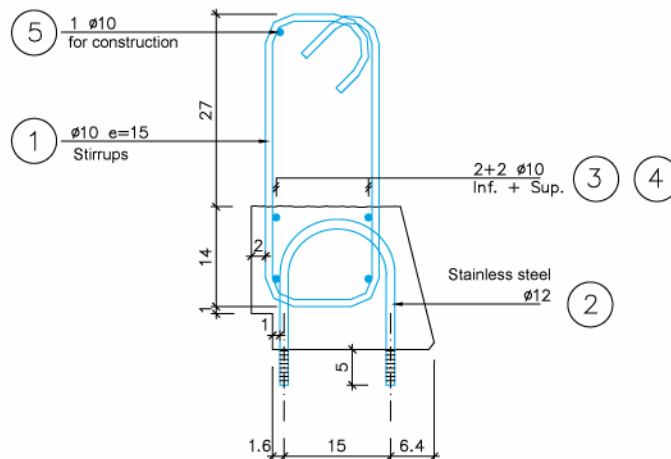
Prefabricated UHPFRC kerb, reinforcement plan, cross section
